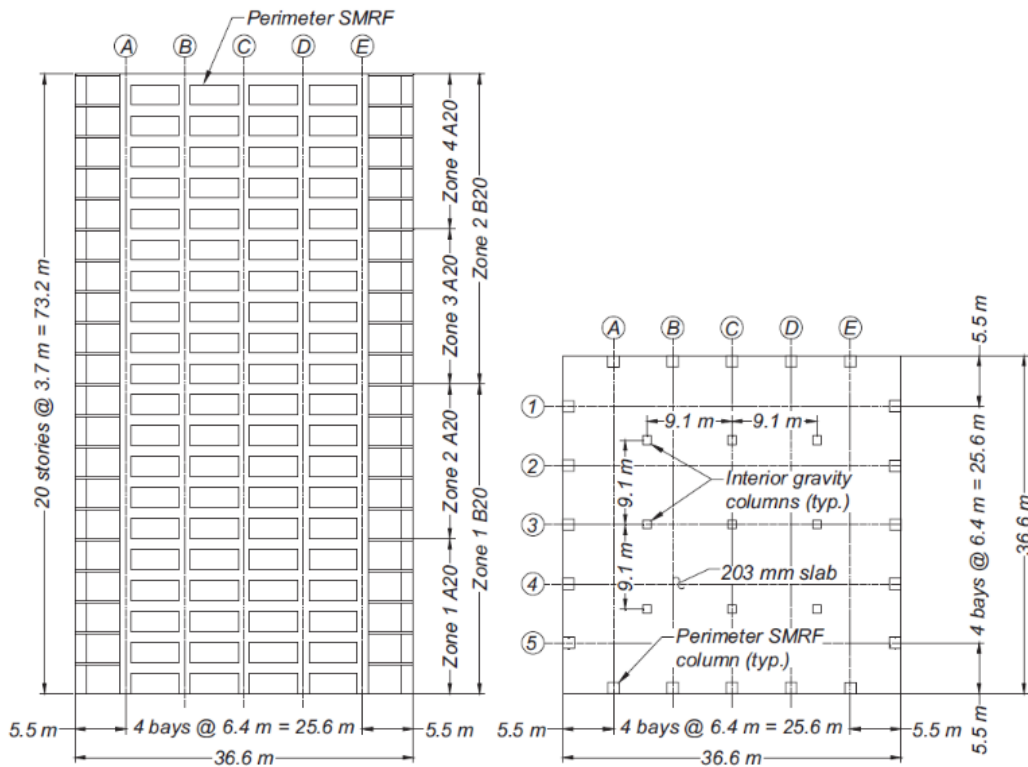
Left: Elevation View and Right: Plan View of Archetype Buildings (Visnjic et al. 2014)
